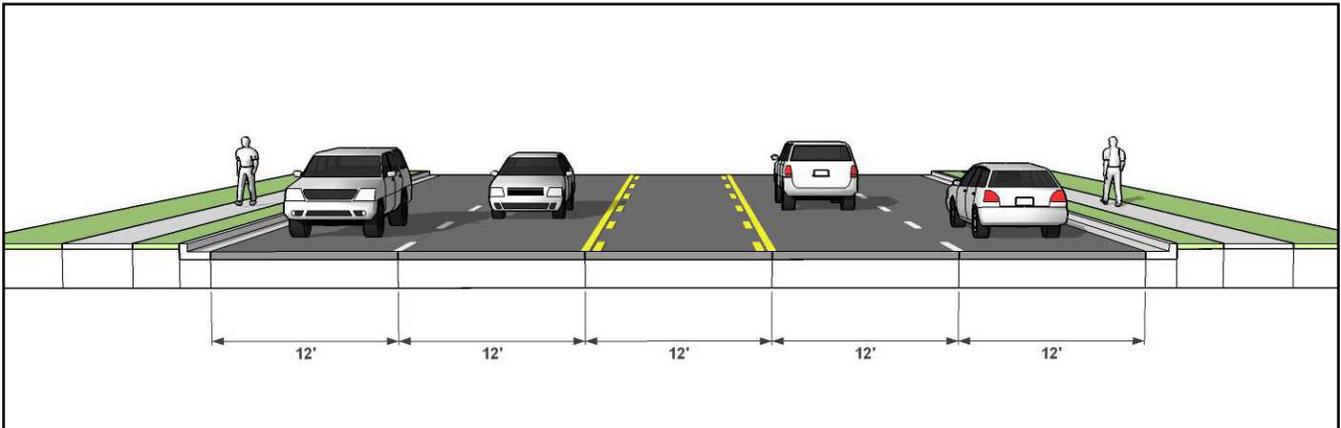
Downtown Zone – Proposed Typical Section – Option A
